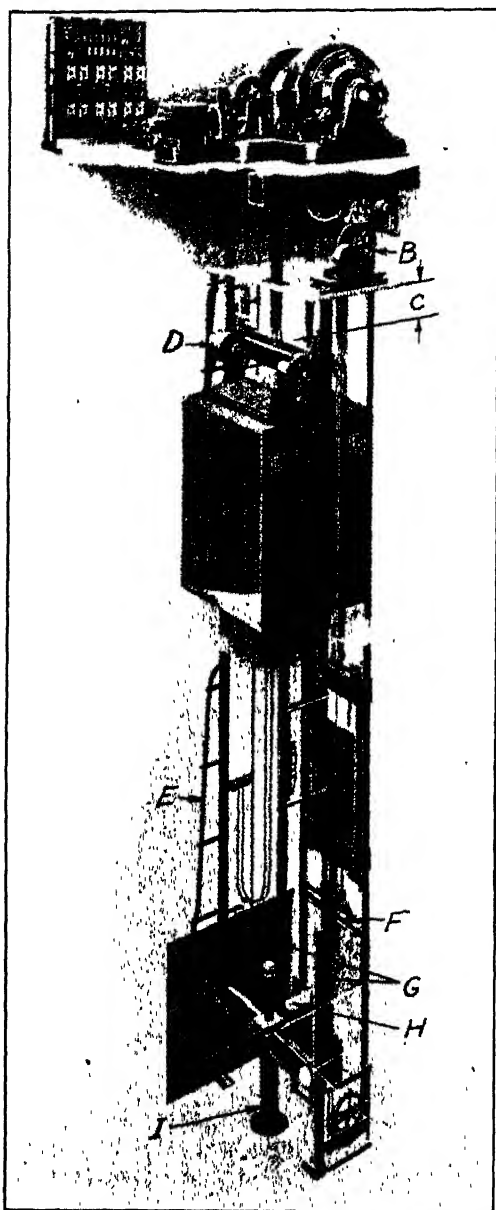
GENERAL ARRANGEMENT OF GEARLESS TRACTION ELEVATOR WITH MICRO-DRIVE MACHINE
